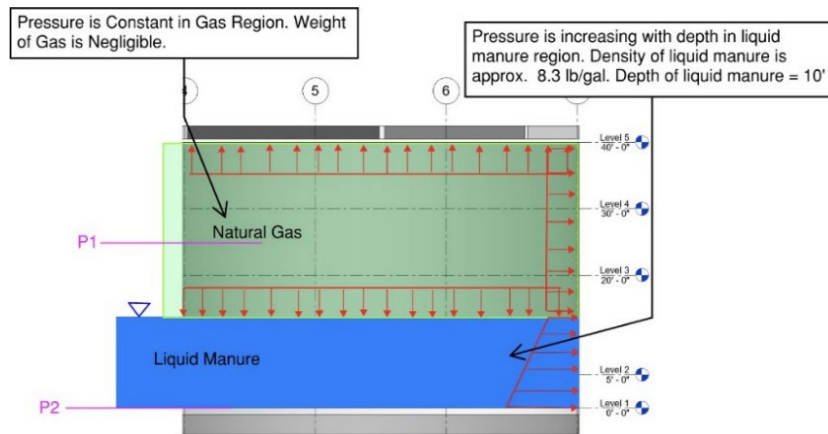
2-D elevation view of digester tank wall with pressure visualization
